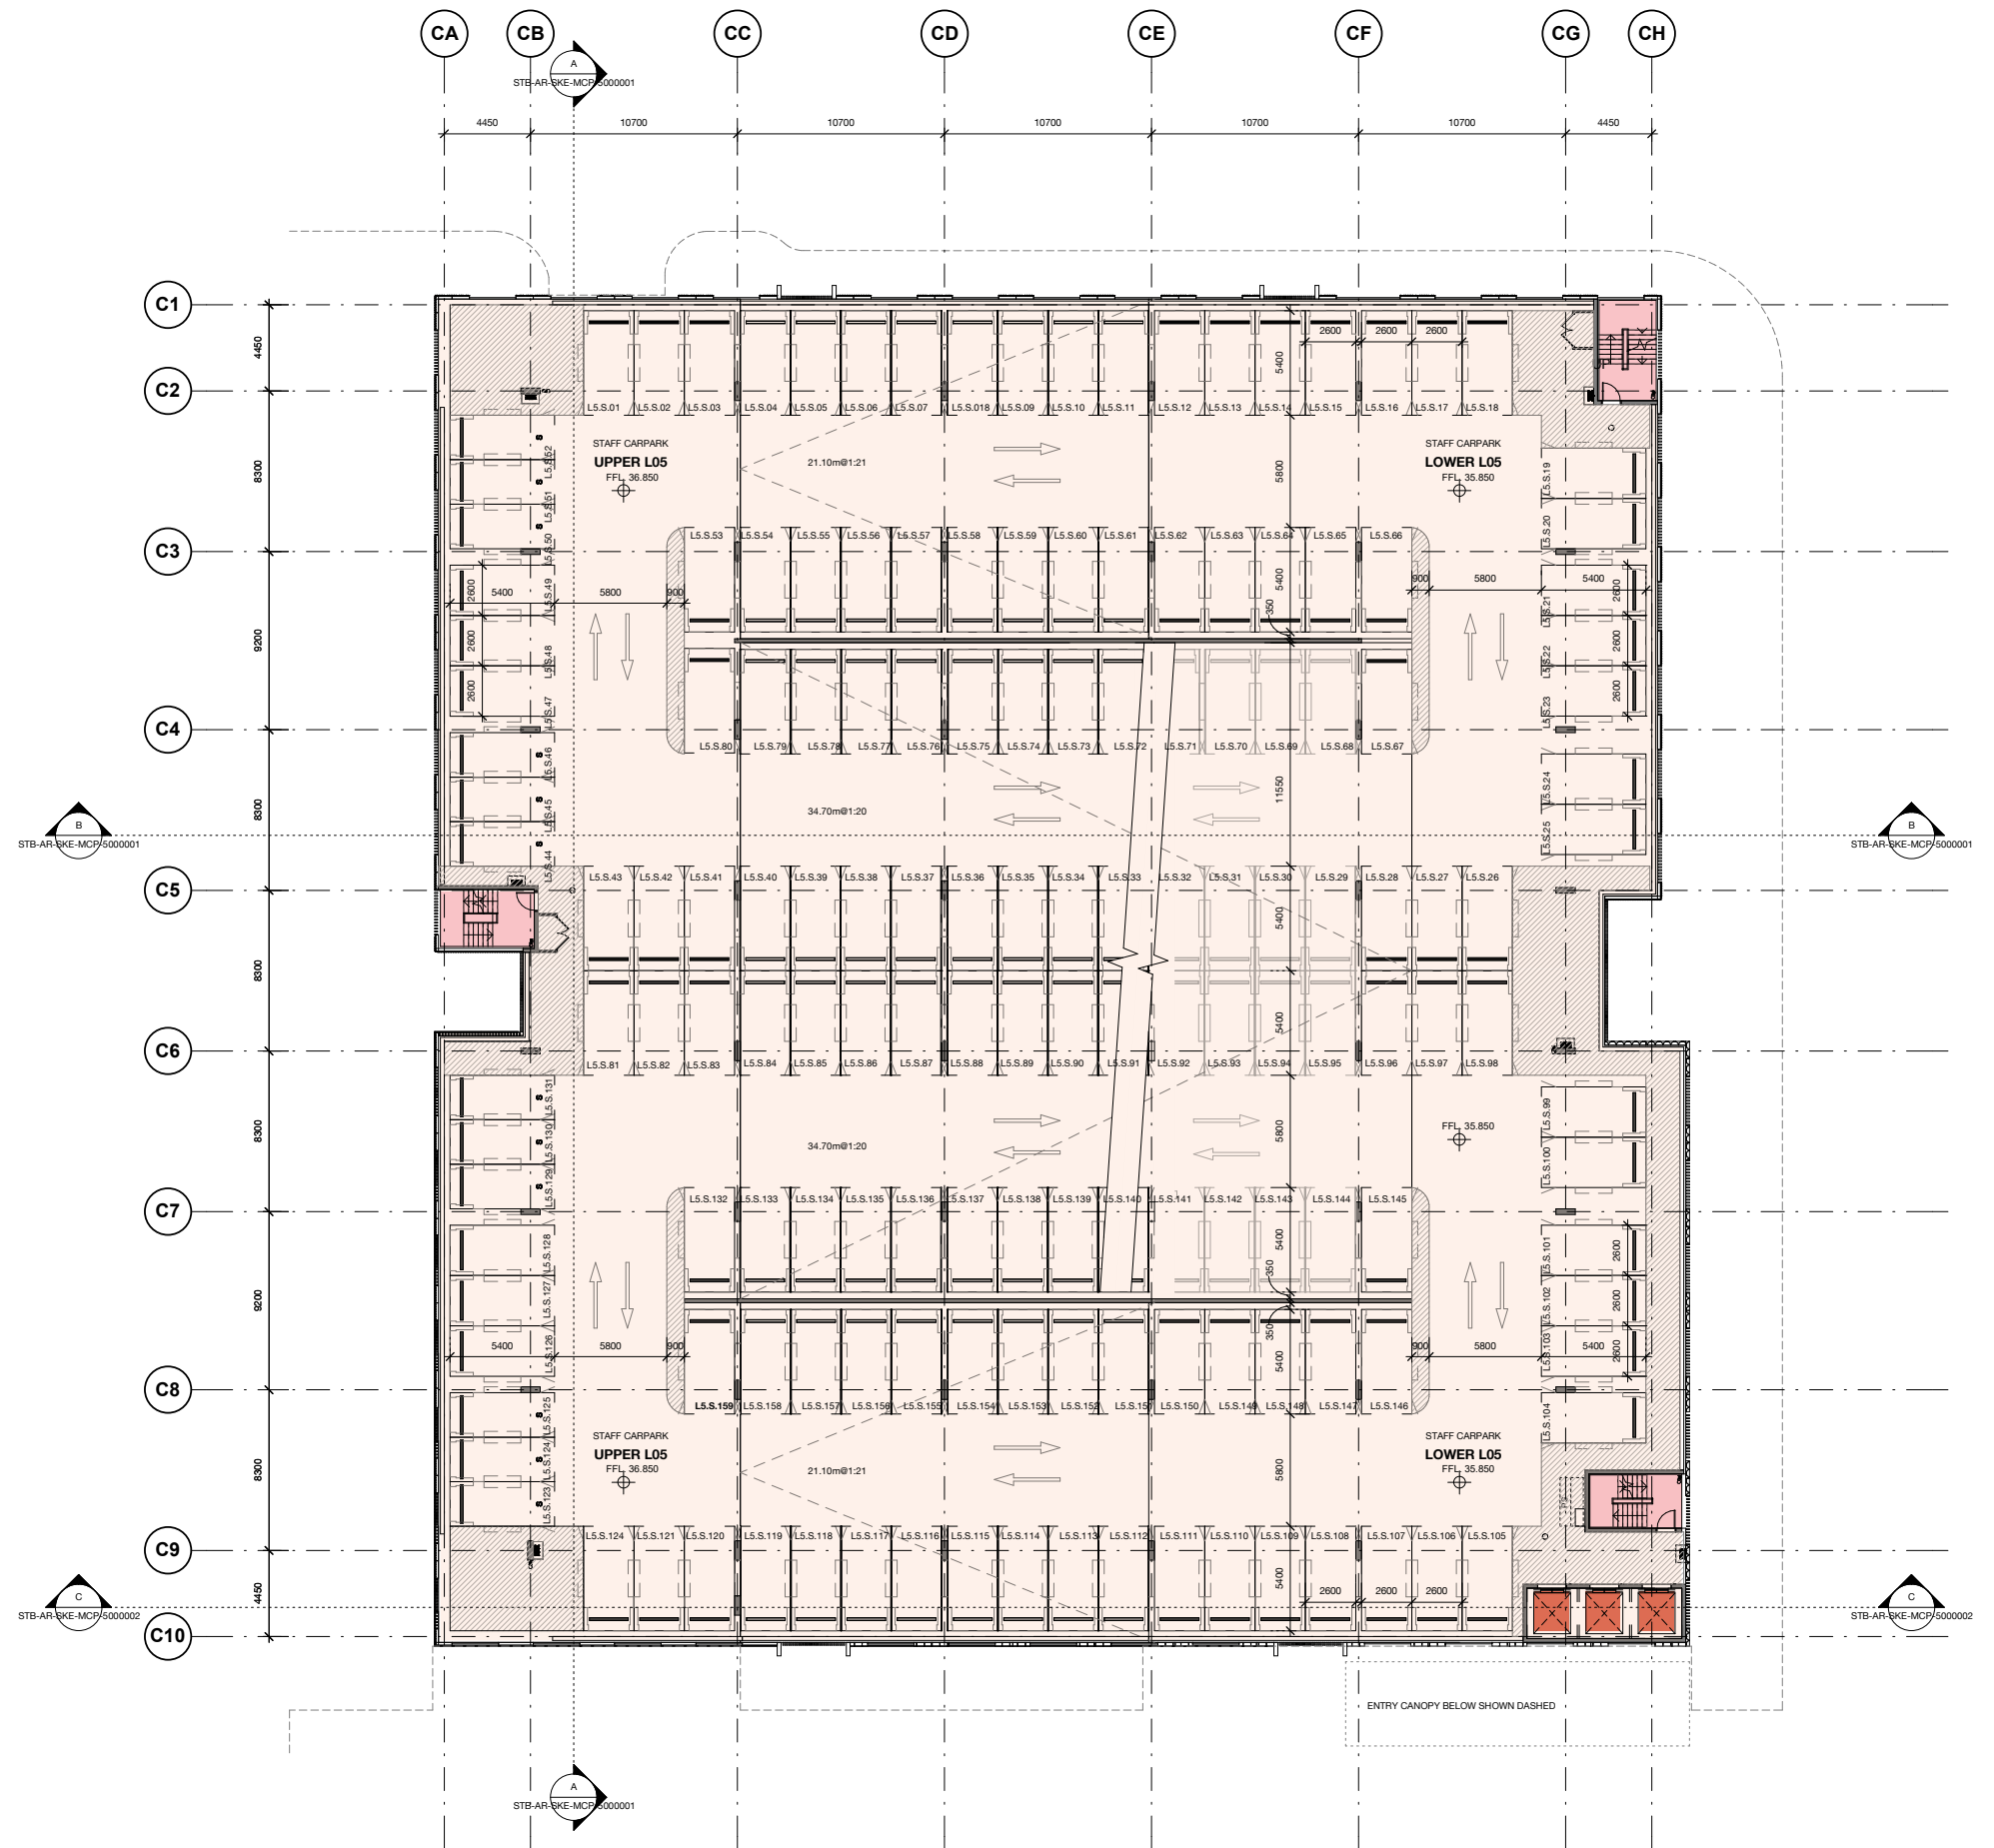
Multi-Deck Carpark, Floor Plan - Level 4
